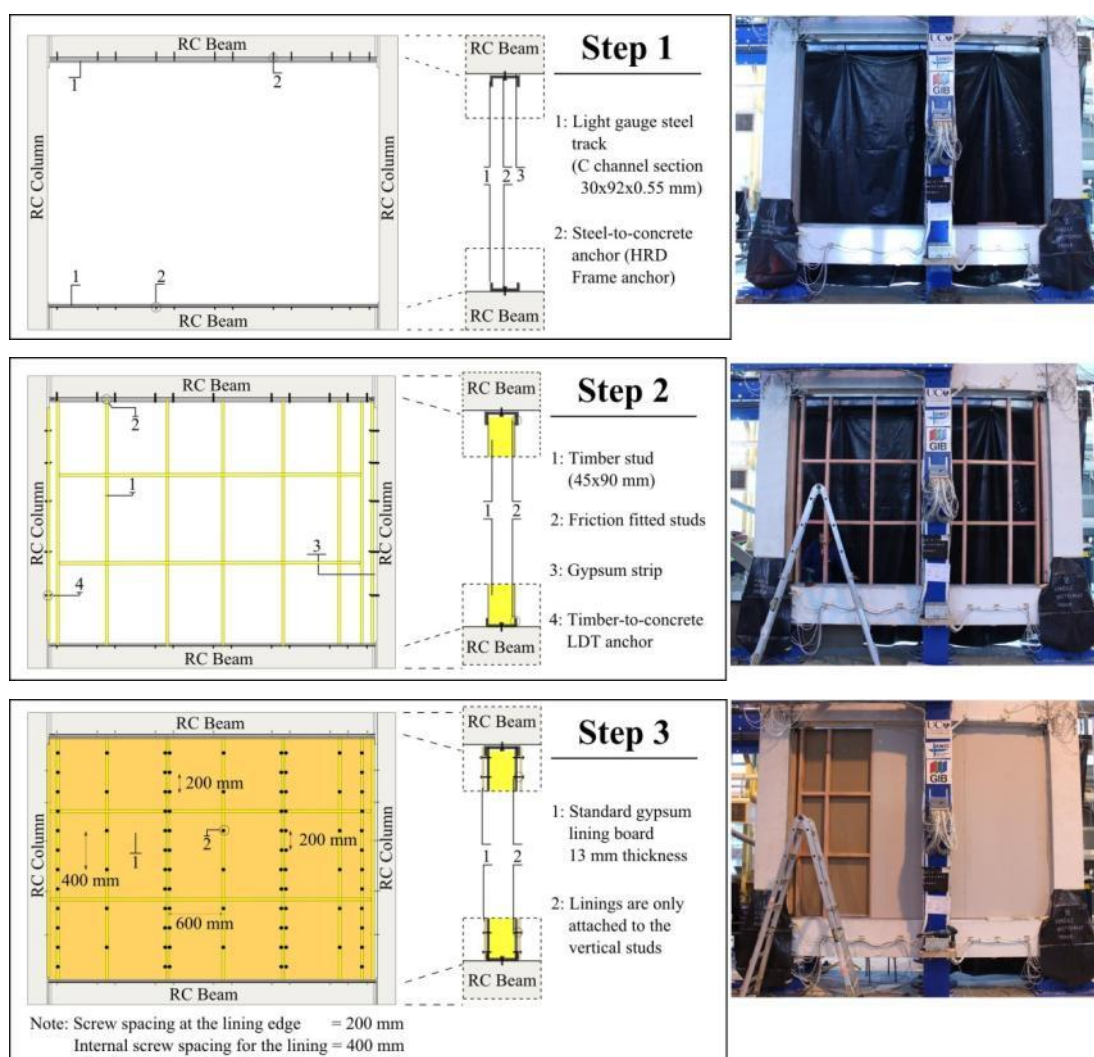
For low damage timber framed drywall; Modifications to the as built timber framed drywall to achieve a low damage solution for timber framed drywall (Modifications were made considering also the behaviour of the low damage steel framed drywall MIF1-STFD)
